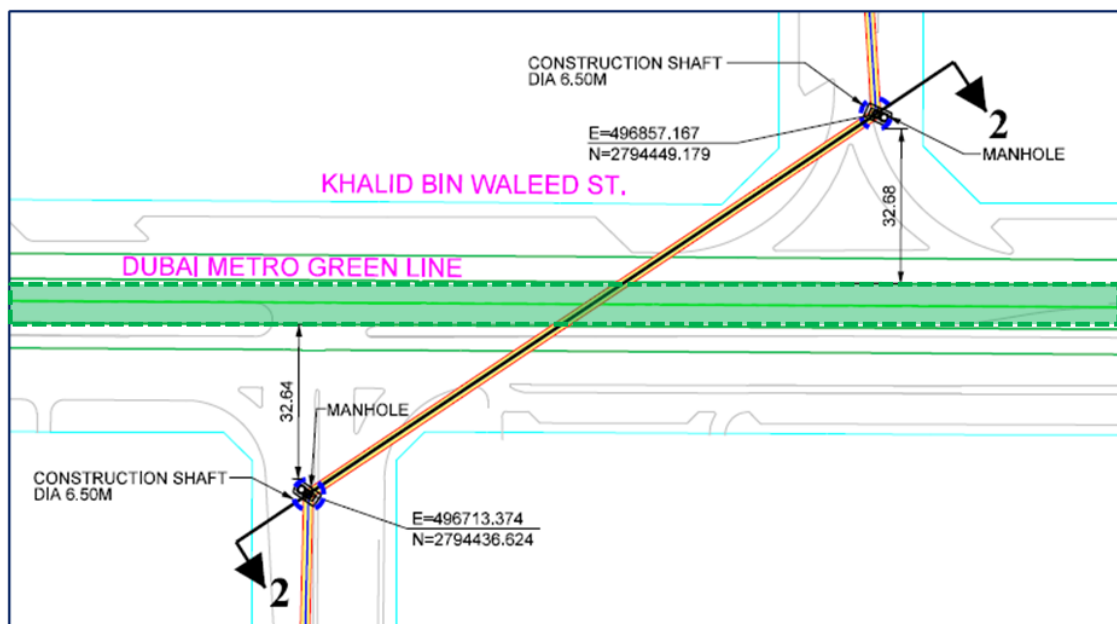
Layout for NDRC interfaced with Railway Tunnel
